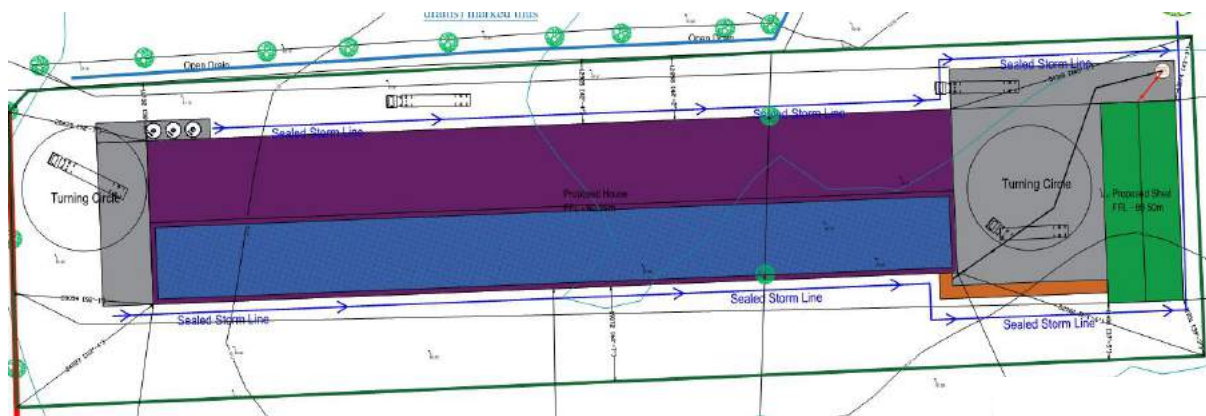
Proposed Poultry Farm Facility Expansion Layout
